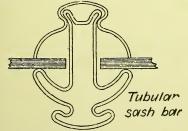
Braby's "Drop-dry" Glazing on Tubular Sash Bar.
